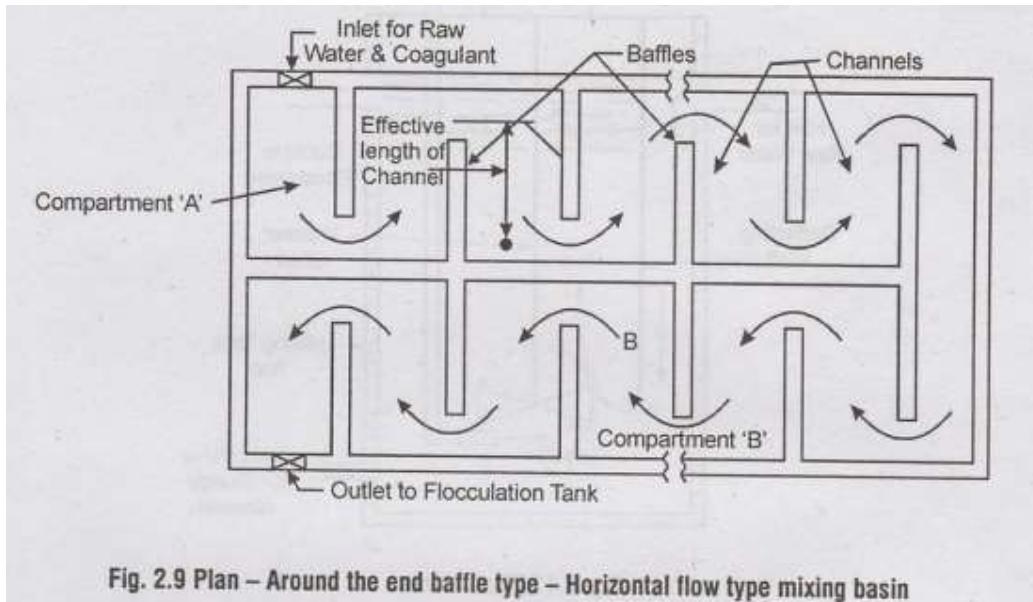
Plan – Around the end baffle type – Horizontal flow type mixing basin
